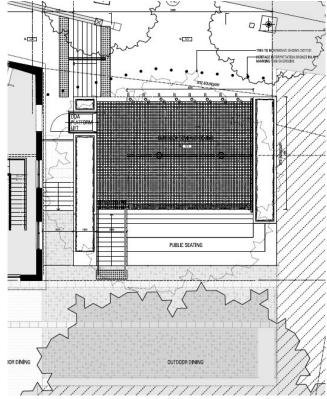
The Proposed Development, Detailed Floor plan *Source: JPW Architects, drawing EA-A-4015
